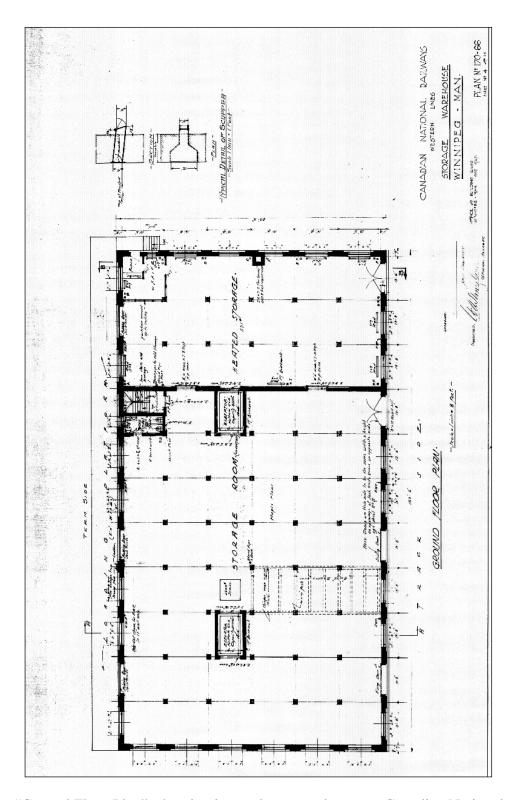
"Ground Floor Plan", showing internal structural system, Canadian National Railways, Storage Warehouse, 1927. (<u>Historical Buildings and Resources Committee</u>.)
